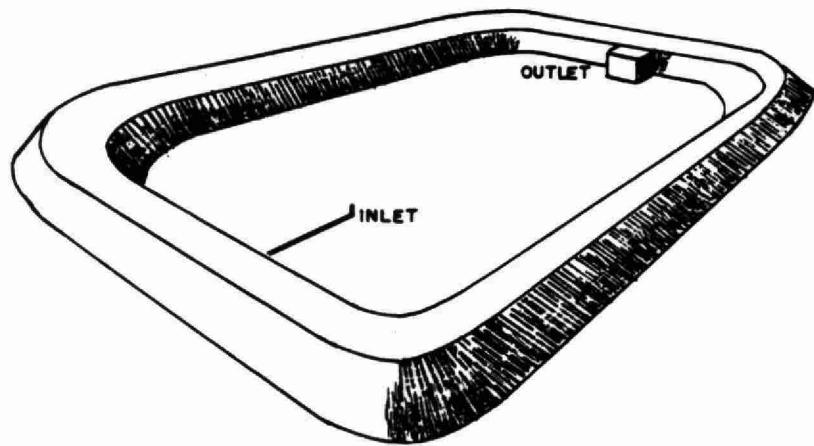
WASTE STABILIZATION POND The pond has a flat floor and the normal water depth is about five feet.
